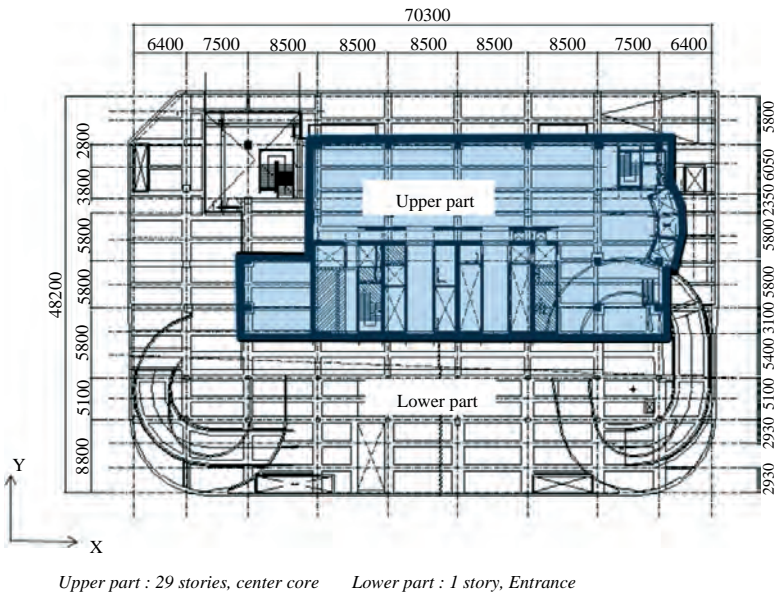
Plan design after rehabilitation (Units: mm)
